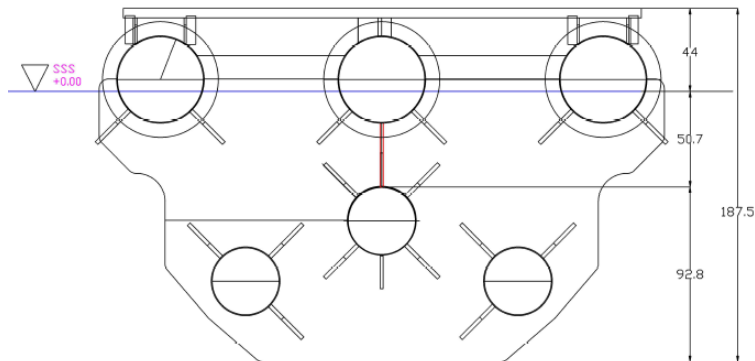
Floating Platform Case1 Model Cross-Section Dimensions. (All dimensions given in the figure are in millimeters.)
